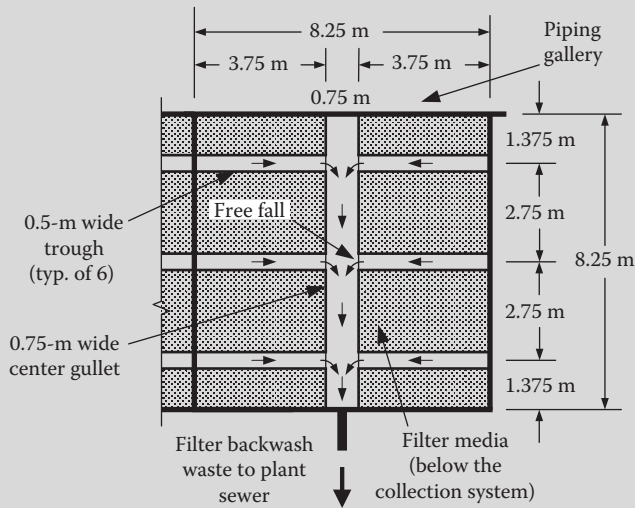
Conceptual layout of backwash waste collection system (Example 15.31).
